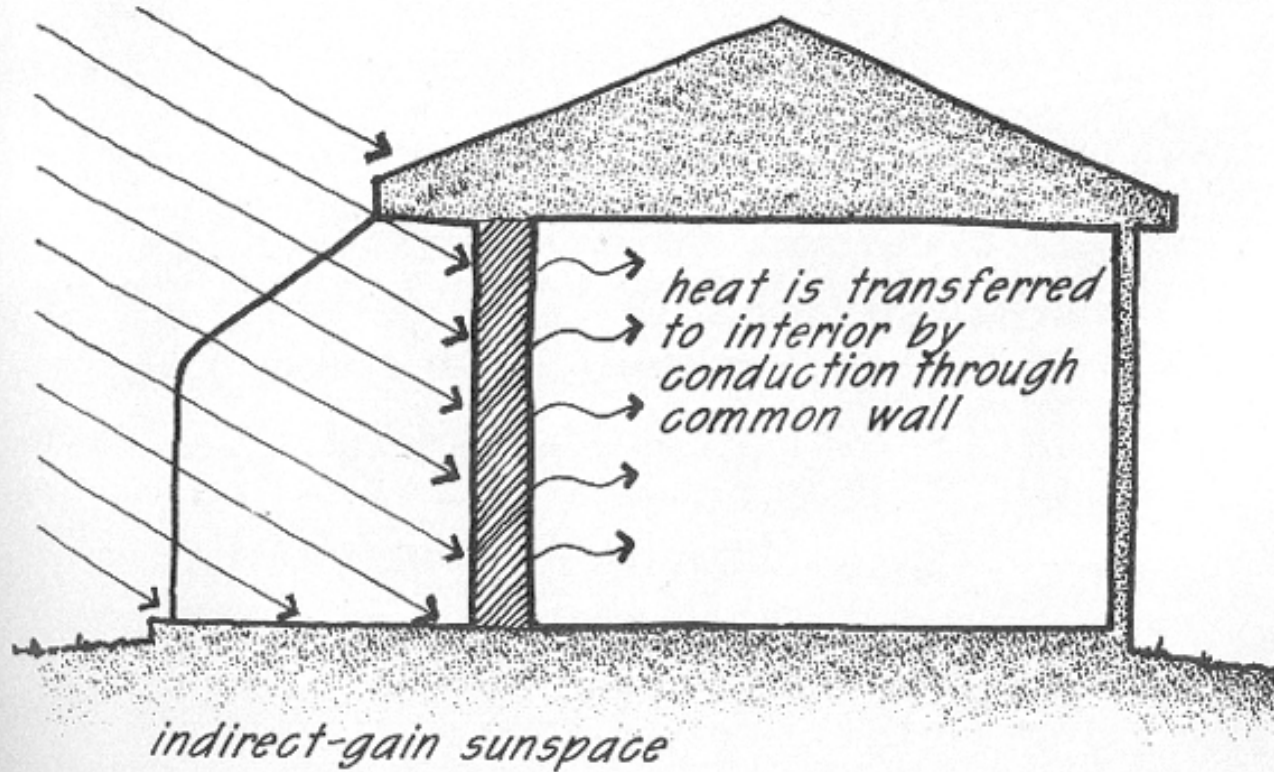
Indirect-gain sunspace building with common thermal storage wall. Conduction through the common wall is the primary means of heat transfer to living space.
